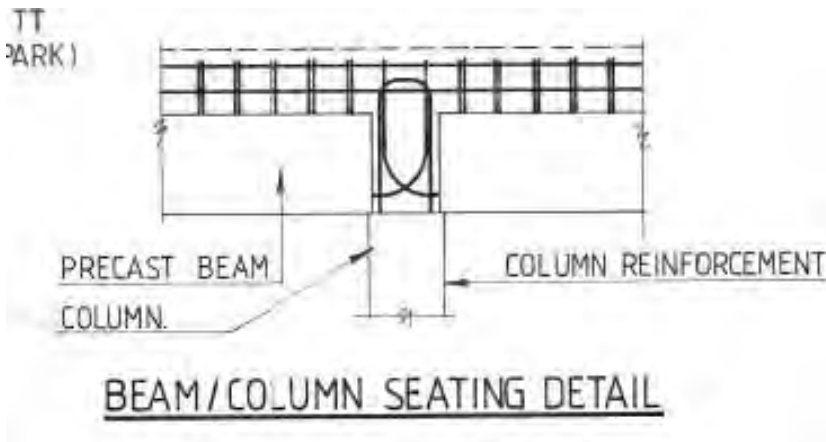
Extract from as-built drawing S2 - showing beam-column seating detail
